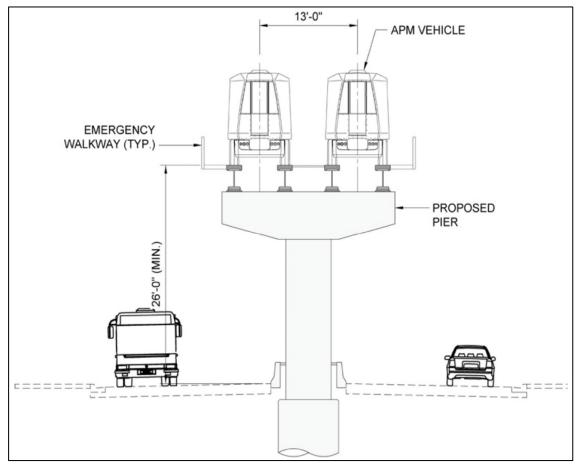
APM Typical Sections North Miami Avenue and 5th Street
